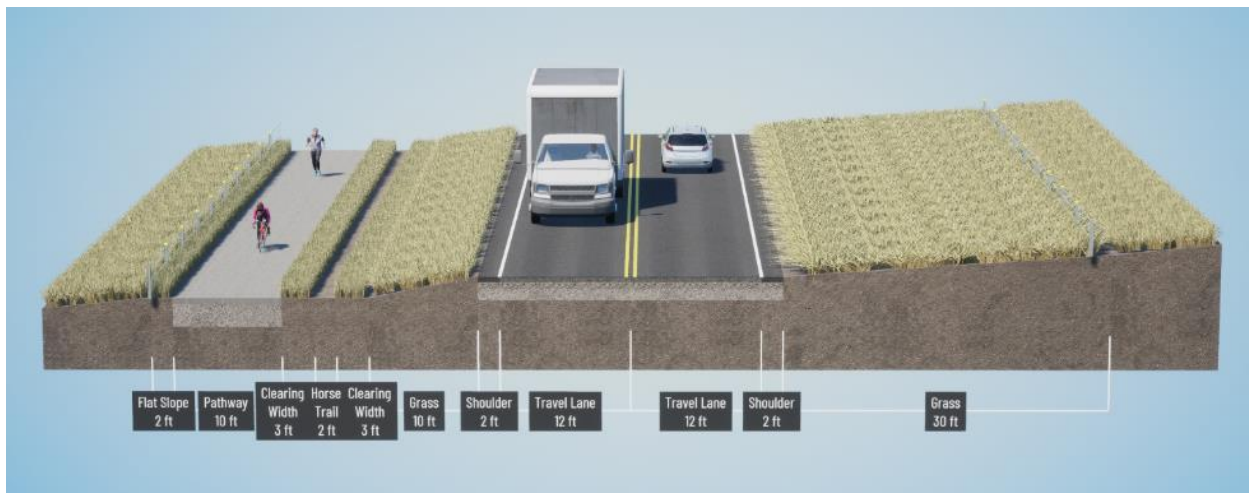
Proposed Typical Section of Beacon Hill Road with Paved Pathway and Horse Trail
